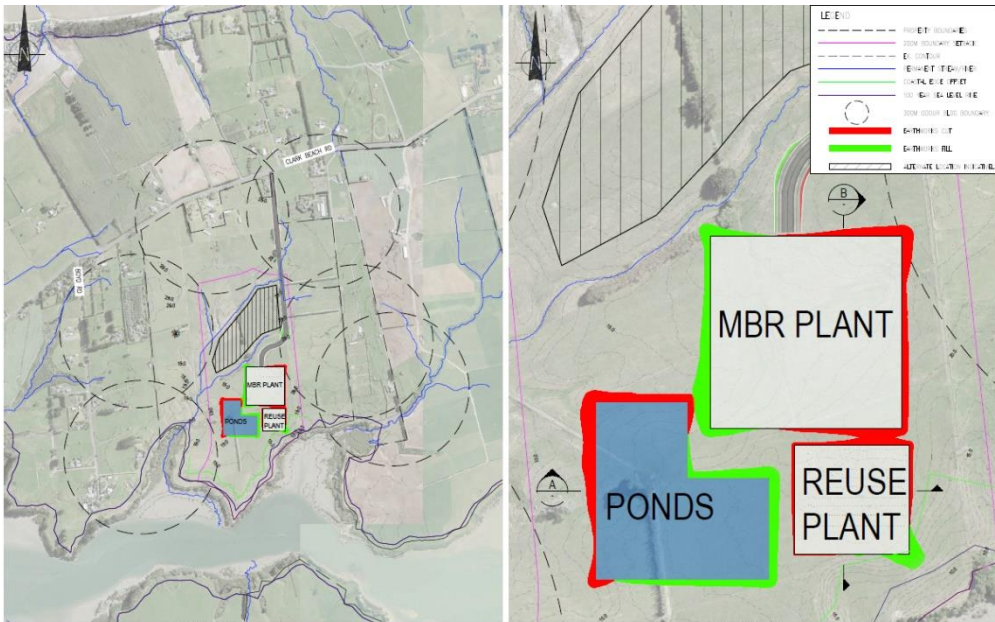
Site B indicative site layout (refer to Appendix E for more detailed plans). Hashed area shows possible alternative WWTP location, dashed circles show 300m from existing residential dwelling.
